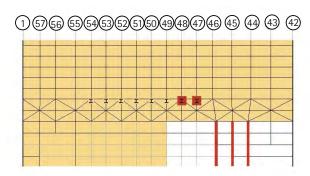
Bridging of north perimeter frame at Stage 4 between Columns 42 and 49 (failed transfer girders and buckled perimeter columns shown in red)
